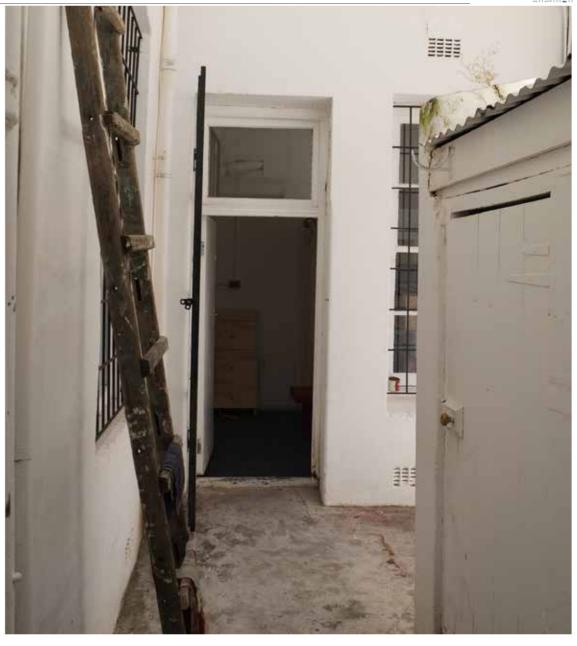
View of rear door from north extension to courtyard, with outbuilding (left). Window (just visible) rebated to internal wall shows the influence of British construction techniques suggesting that the north extension is a later addition
